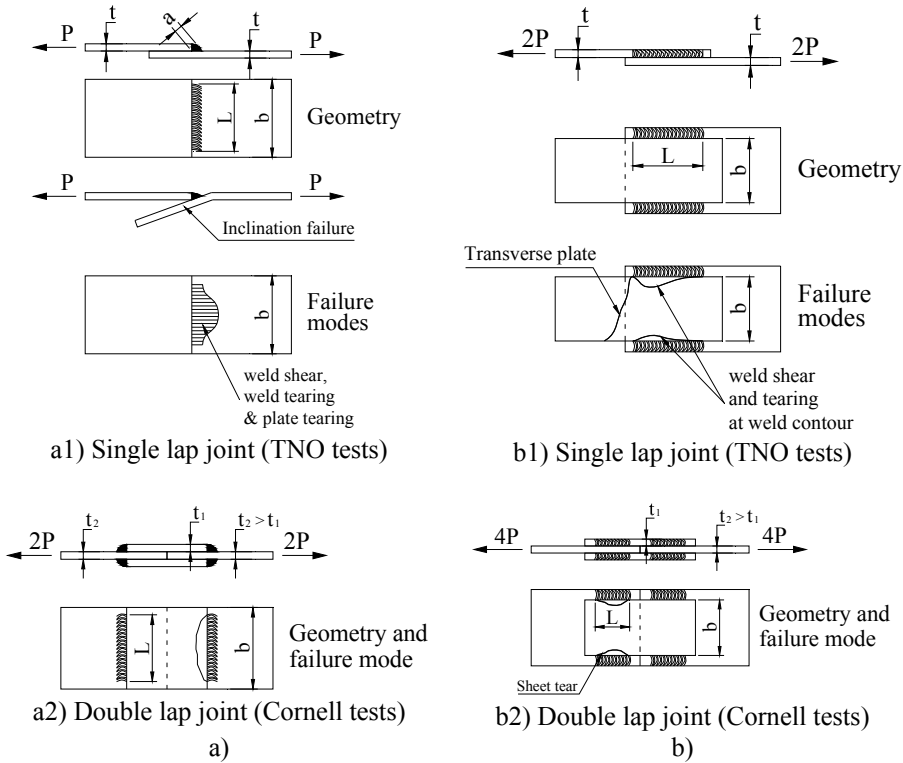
Failure modes in fillet welds: a) transverse weld action; b) longitudinal weld action (Stark & Soetens, 1980)
